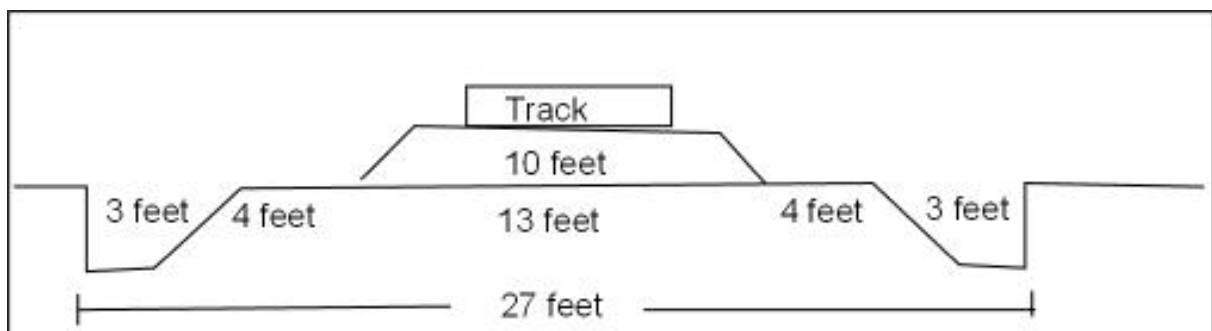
Cross-section of a typical railroad grade (drawing by author)
